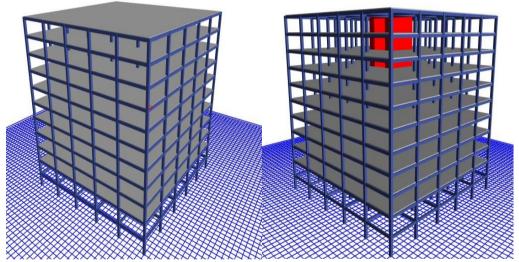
Building without shear wallFigure 3: Building with shear wall at center
